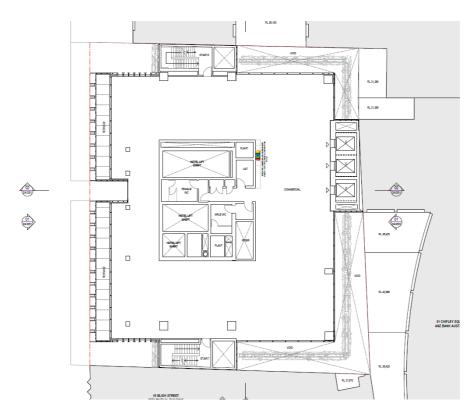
| Proposed level 10 (Source: Woods Bagot)
